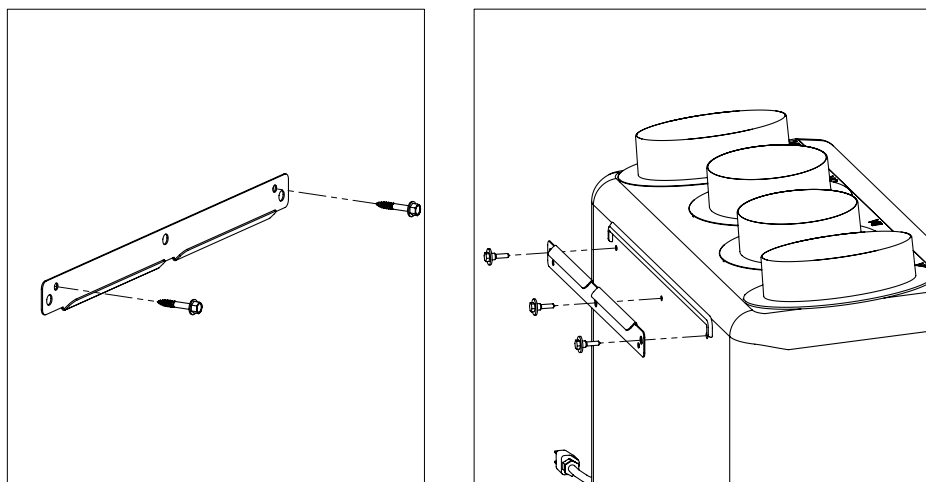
WALL BRACKET INSTALLATION DETAIL
